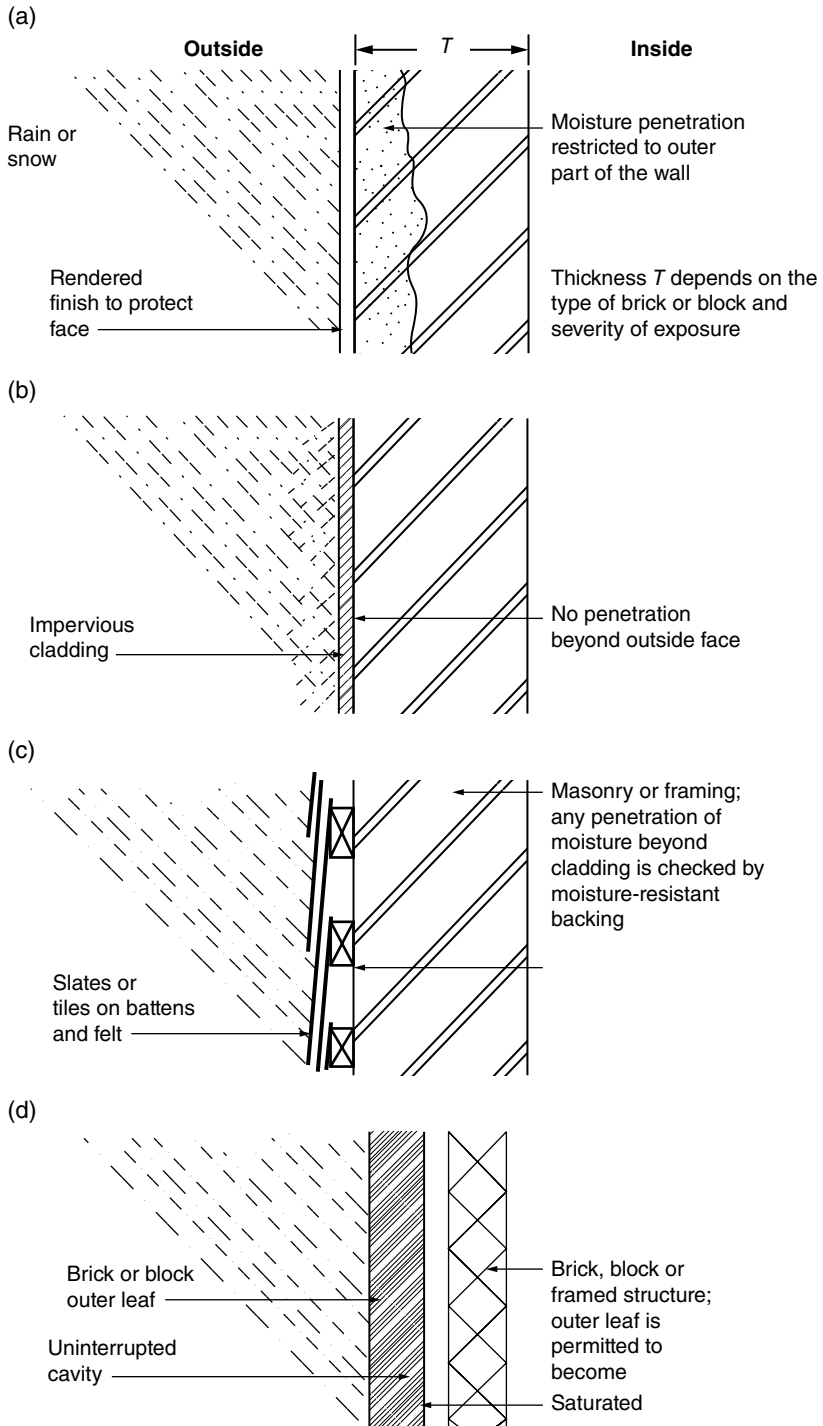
Weather resistance of external walls – principles. (a) Solid external wall. (b) Impervious cladding. (c) Weather-resistant cladding. (d) Cavity wall.
